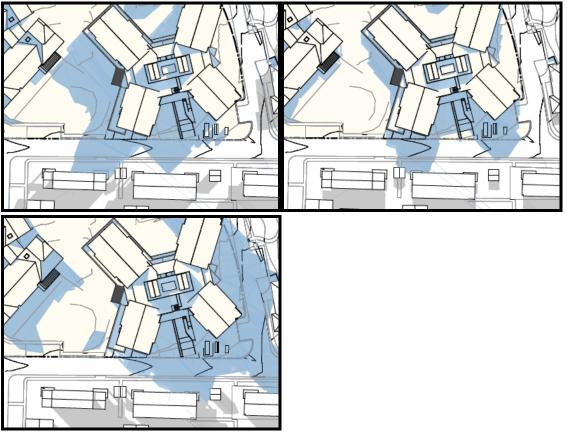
Shadows cast by Building 10 onto Thomas Avenue (9am top left, 12pm top right and 3pm bottom left)
